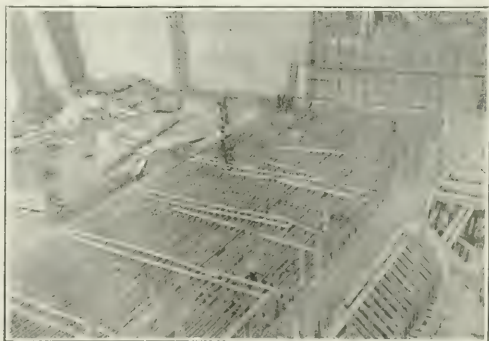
Floor of Storage Pit During Construction, Showing Old Rails Used as Armor.
